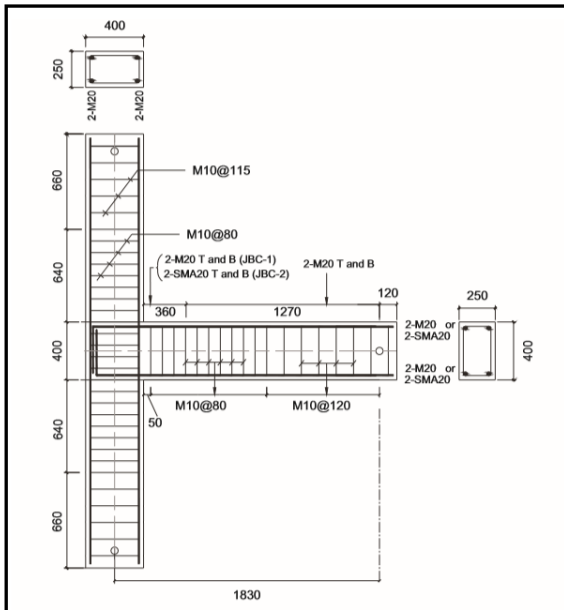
Dimensions and reinforcement details for the exterior reinforced concrete beam-column joints (Youssef et al. (2008))
